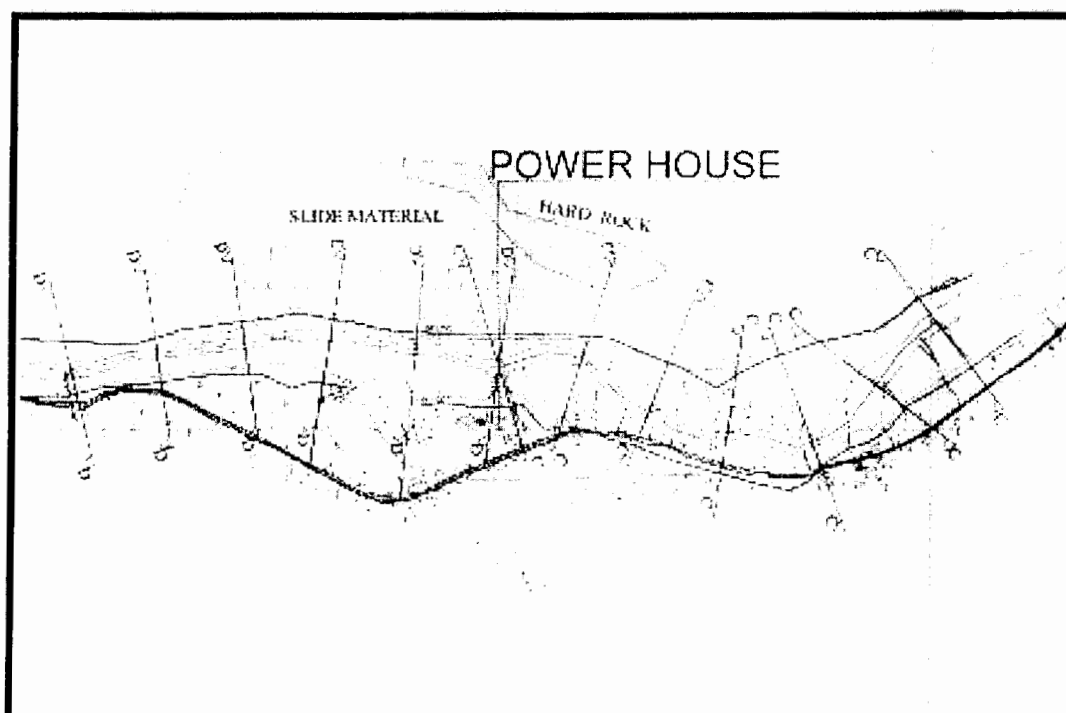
Overview of River Cross-sections Surveyed at Powerhouse Site
